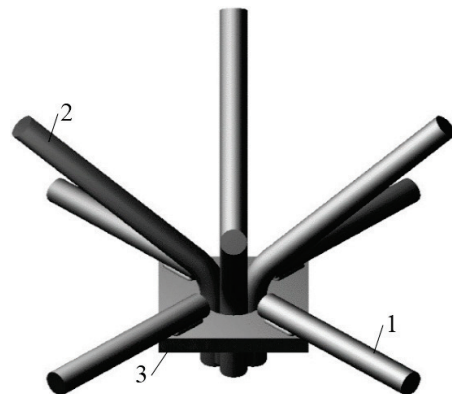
Welded node of space grid structure: 1 – bottom chord; 2 – slanted rods; 3 – steel plate
